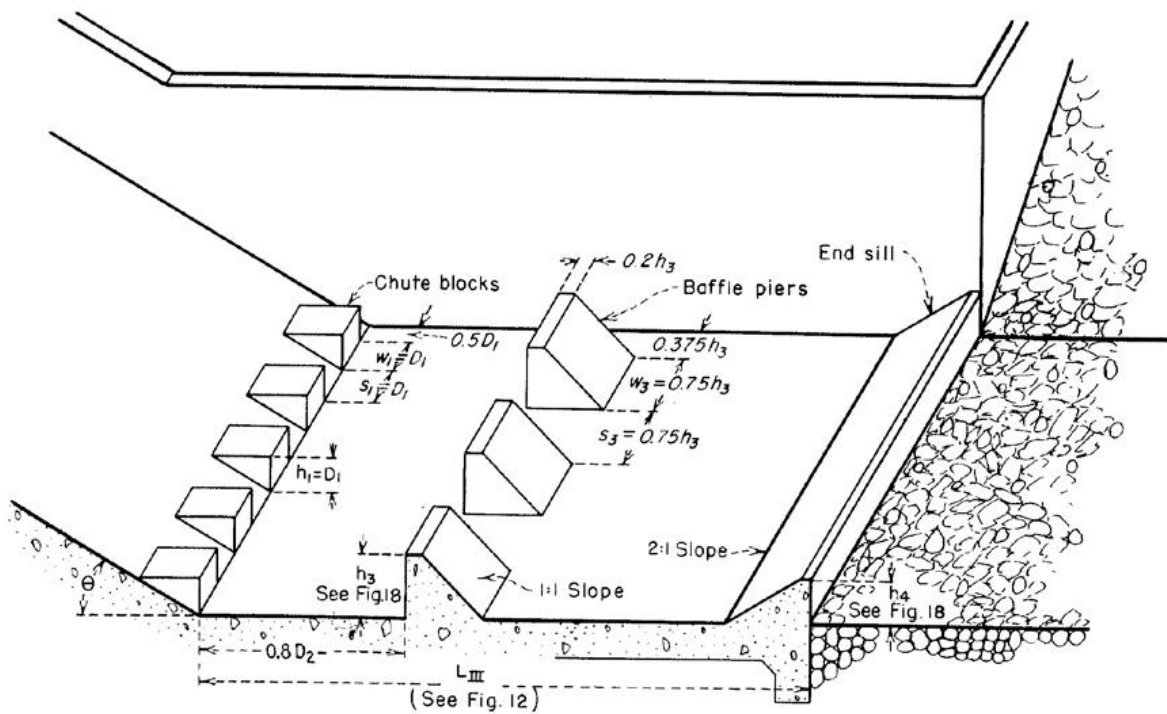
Layout of Reclamation Type III stilling basin (Peterka, 1978).
